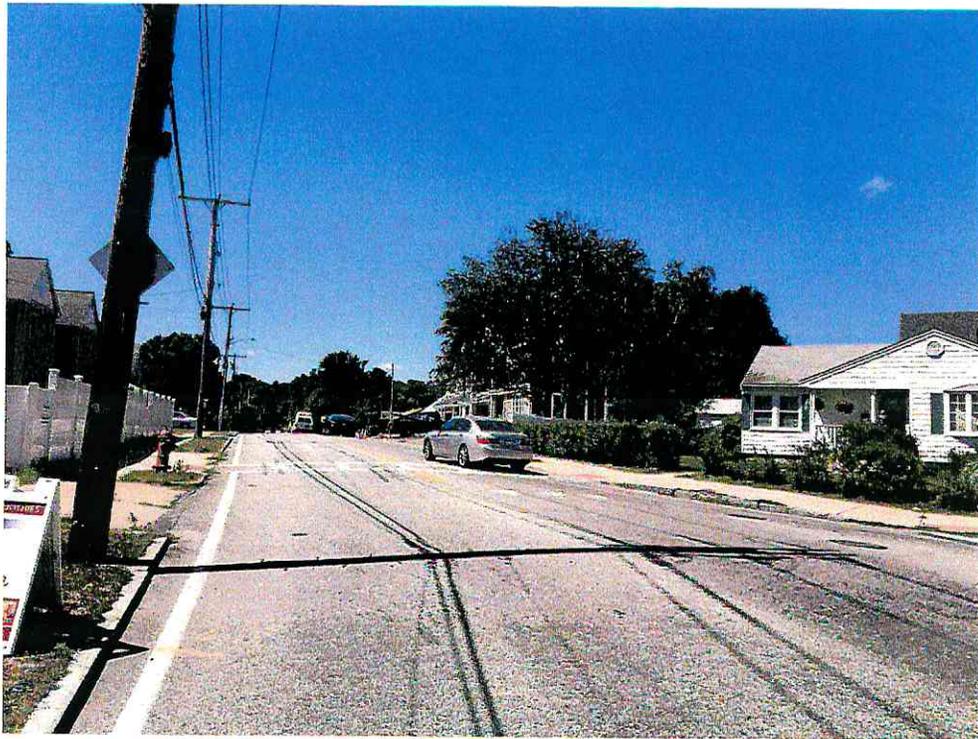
Location m – Cross St. looking west. 160' west of Lowell Ave.
